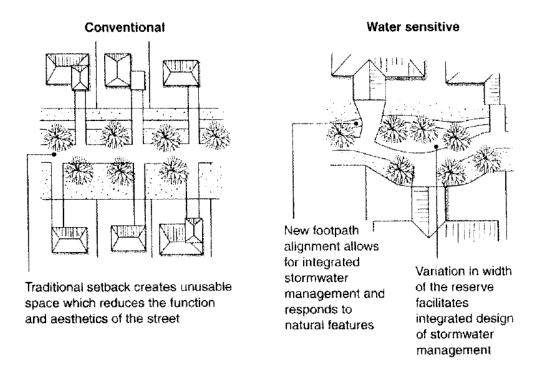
Conventional and WSUD road layouts (Source: Engineers Australia 2006)
